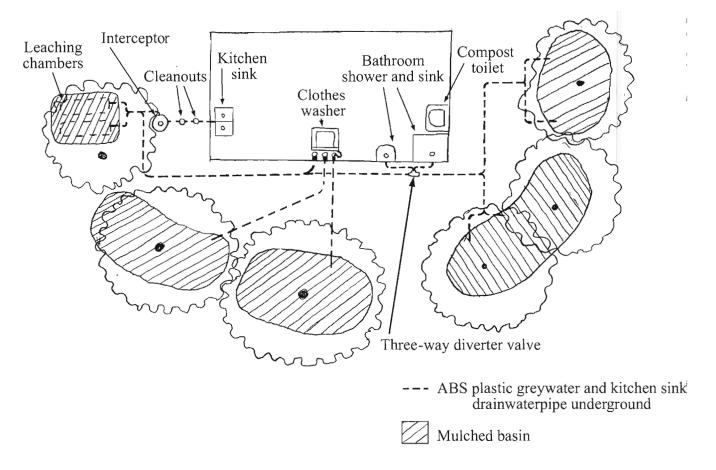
Plan view of a Kitchen Resource Drain, composting toilet, and greywater system for a single-bedroom household, having no backup sewer or septic system. In such an instance, the State of Arizona requires all greywater lines (here the washing machine, bathroom sink, and shower) to be linked to either a multi-drain system or a three-way diverter valve that can direct the greywater to the KRD's subsurface chambers (after bypassing the interceptor) if the greywater basins become a nuisance.
